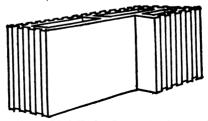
A Half Jamb Block Used to Break Joints Without Cutting Tile
